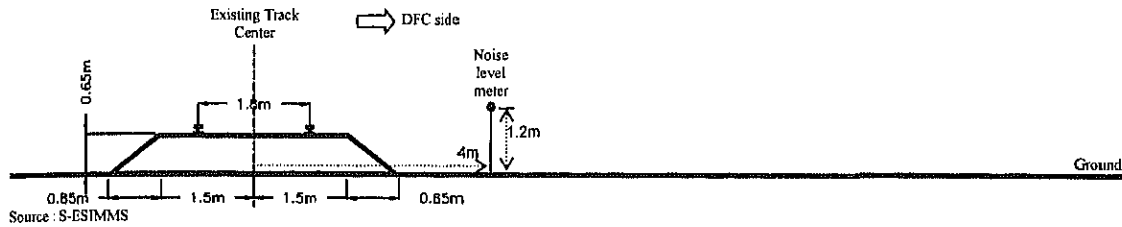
Cross-section view of N-1 Measurement Site in Narnaul
